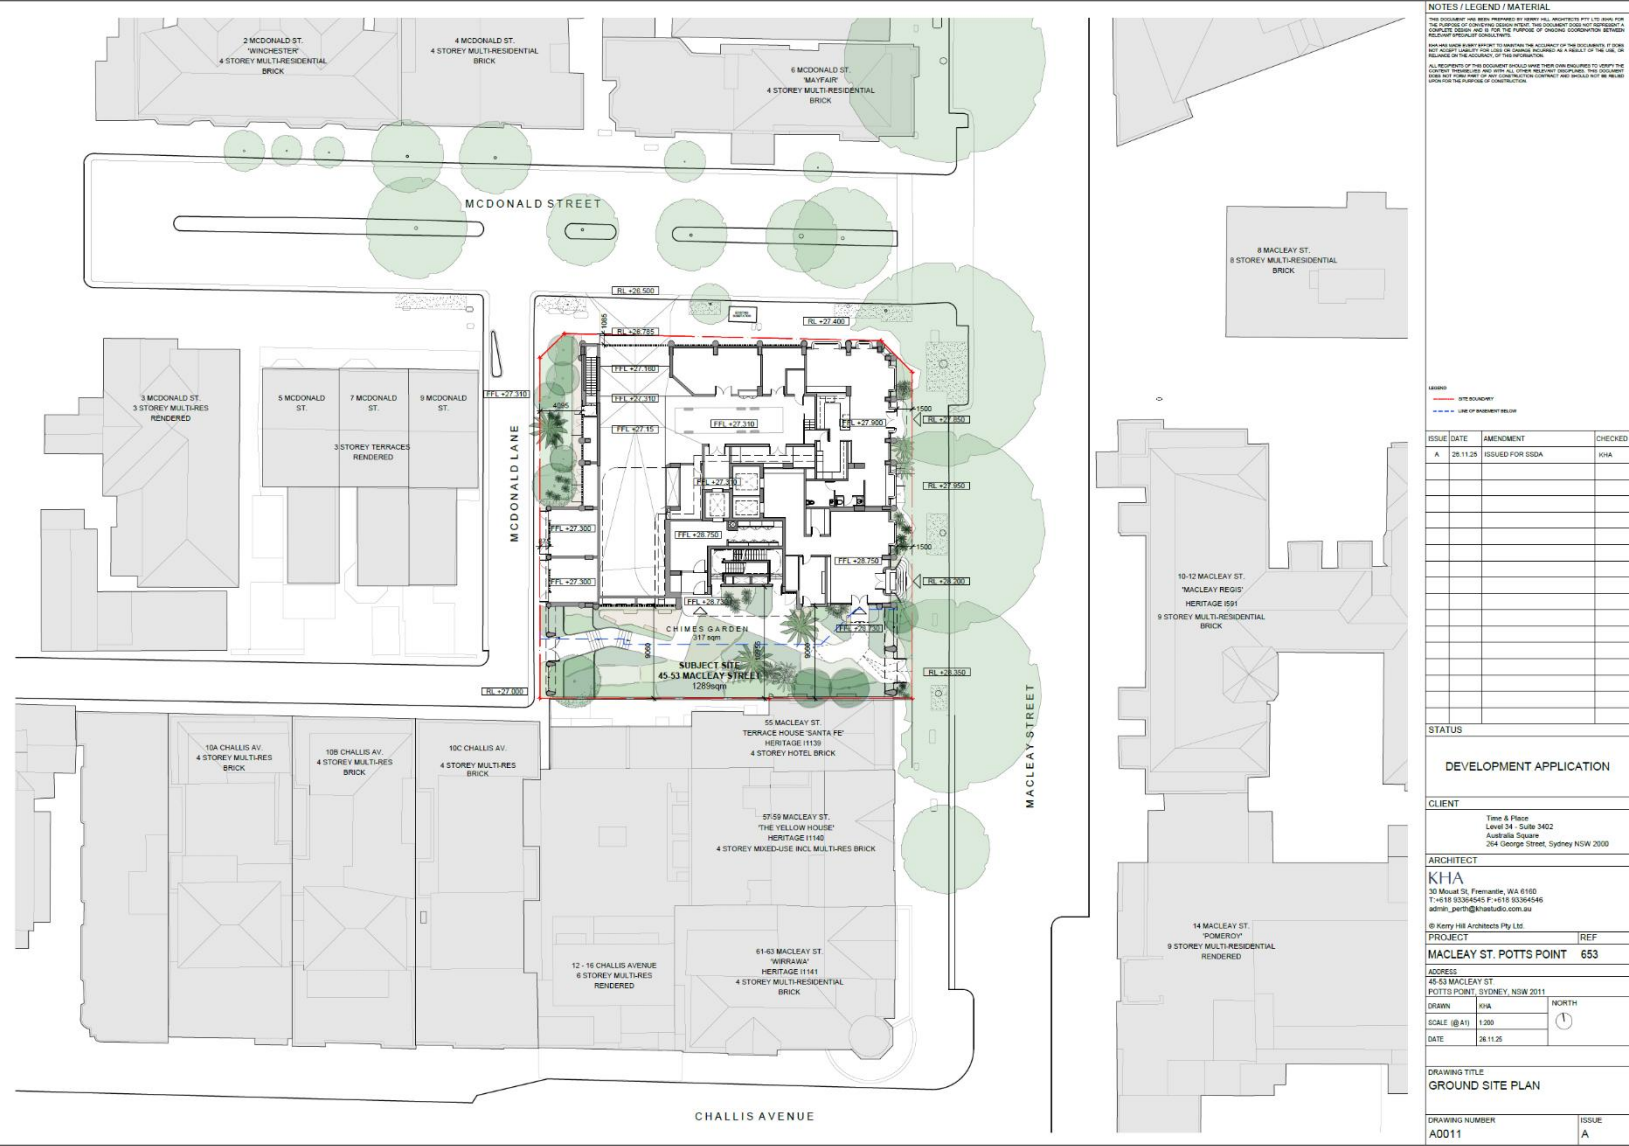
Ground Site Plan (Kerry Hill Architects)
